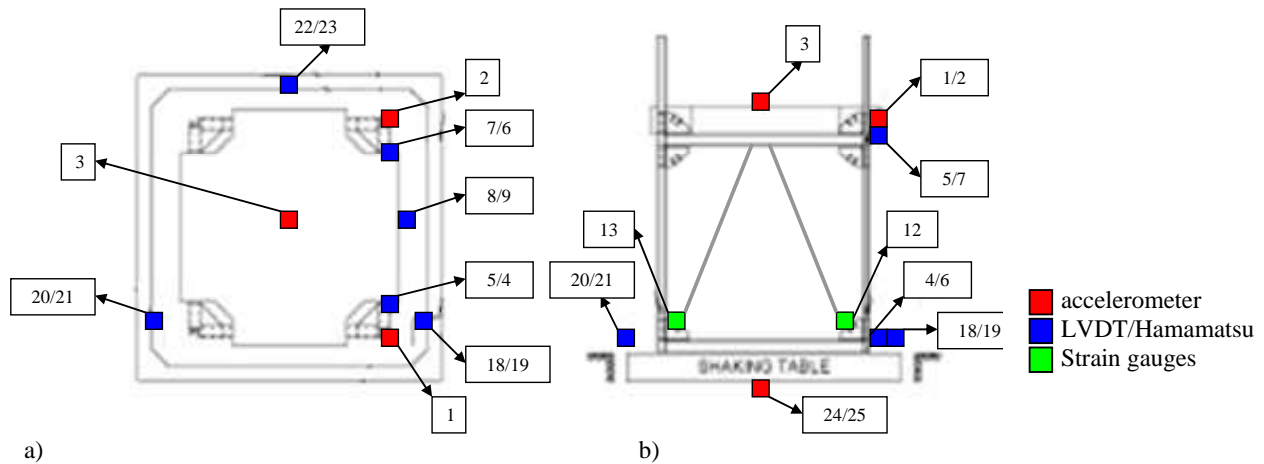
Instrumentation set-up of SPECIMEN I at LNEC: a) Plan view and b) Elevation.
